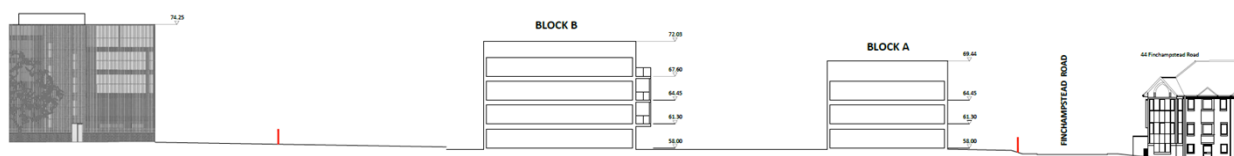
cross section between the Finchampstead road and the existing multi-storey car park.
